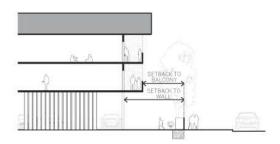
front boundary setback to balcony and wall
